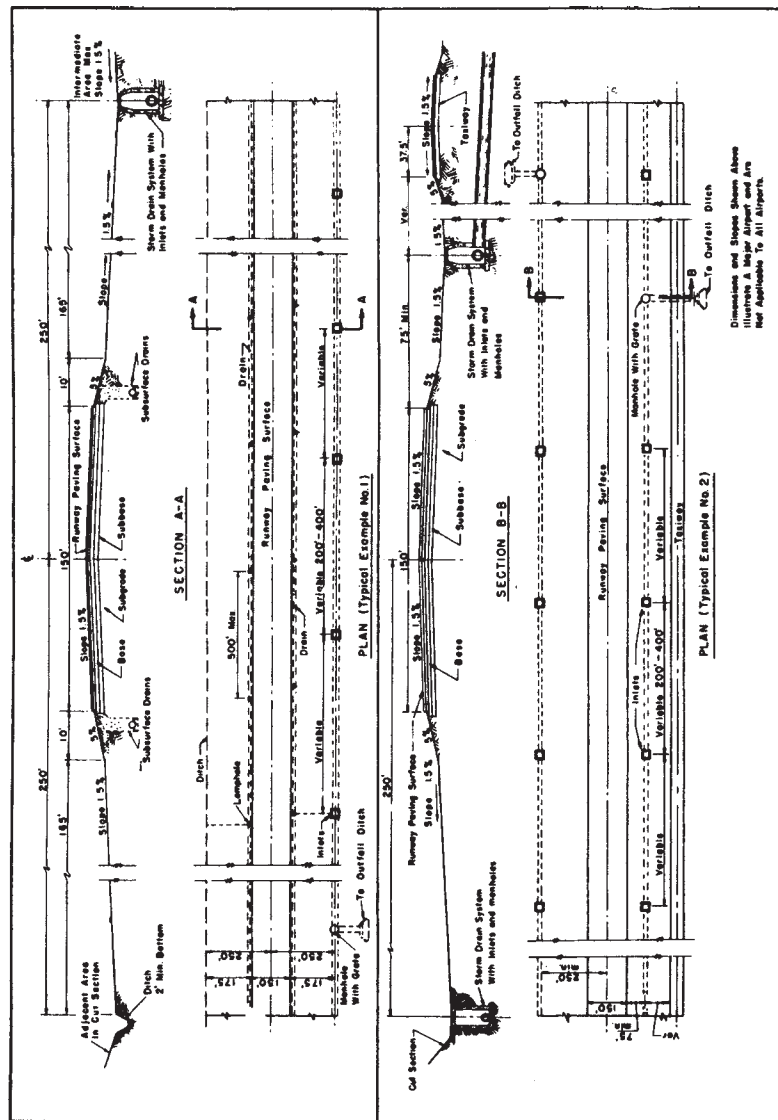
Typical runway safety area and runway drainage cross section (1).
